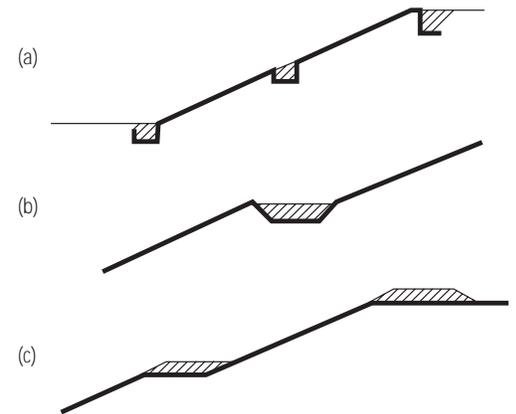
Examples of anchor trenches (*a*, *b*) and a bench (*c*).
